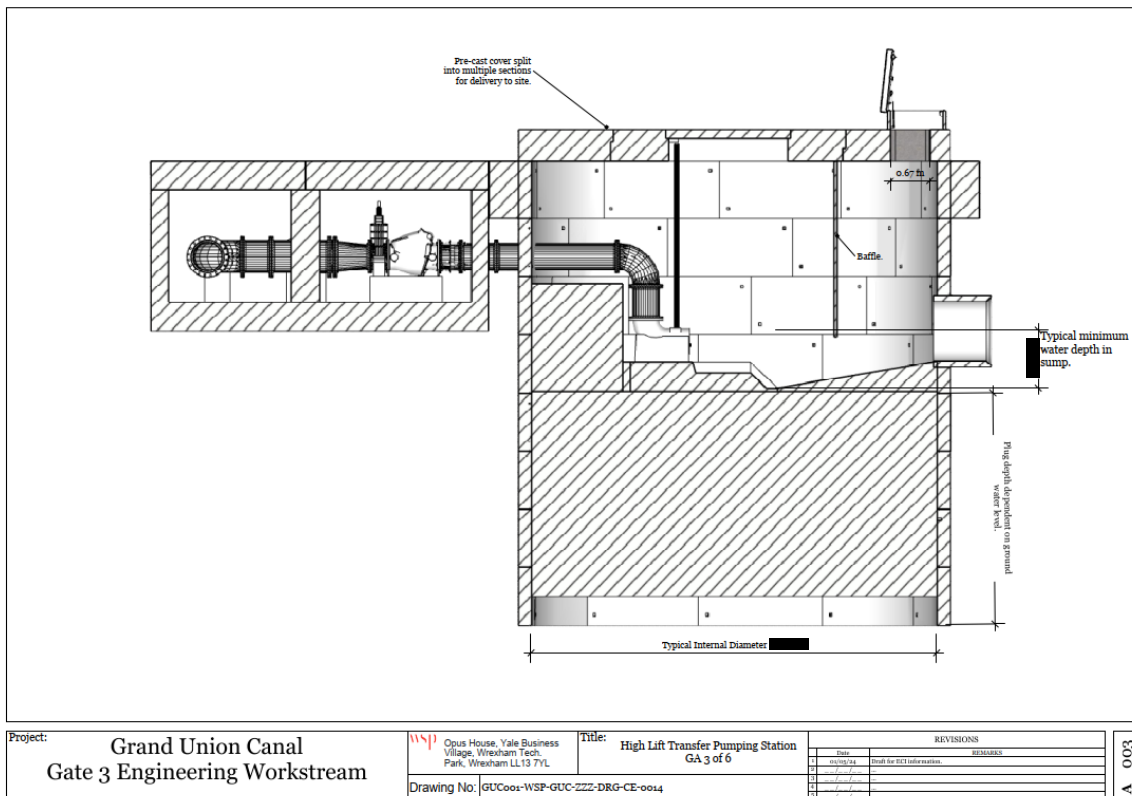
Transfer Pumping Station General Arrangement Section View
